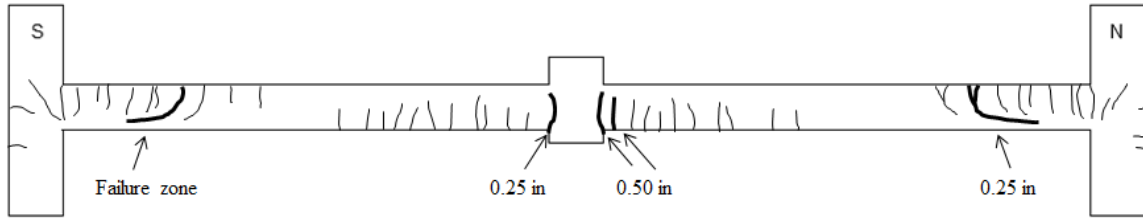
Crack pattern of Specimen 3 at failure: Force = 34 kip; center displacement = 13.8 in.
